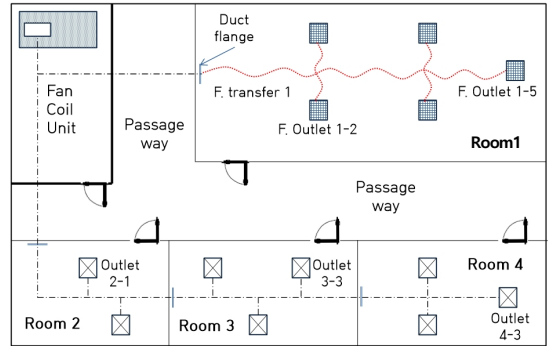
Example of HVAC system arrangement applying both Steel duct and Fabric duct
